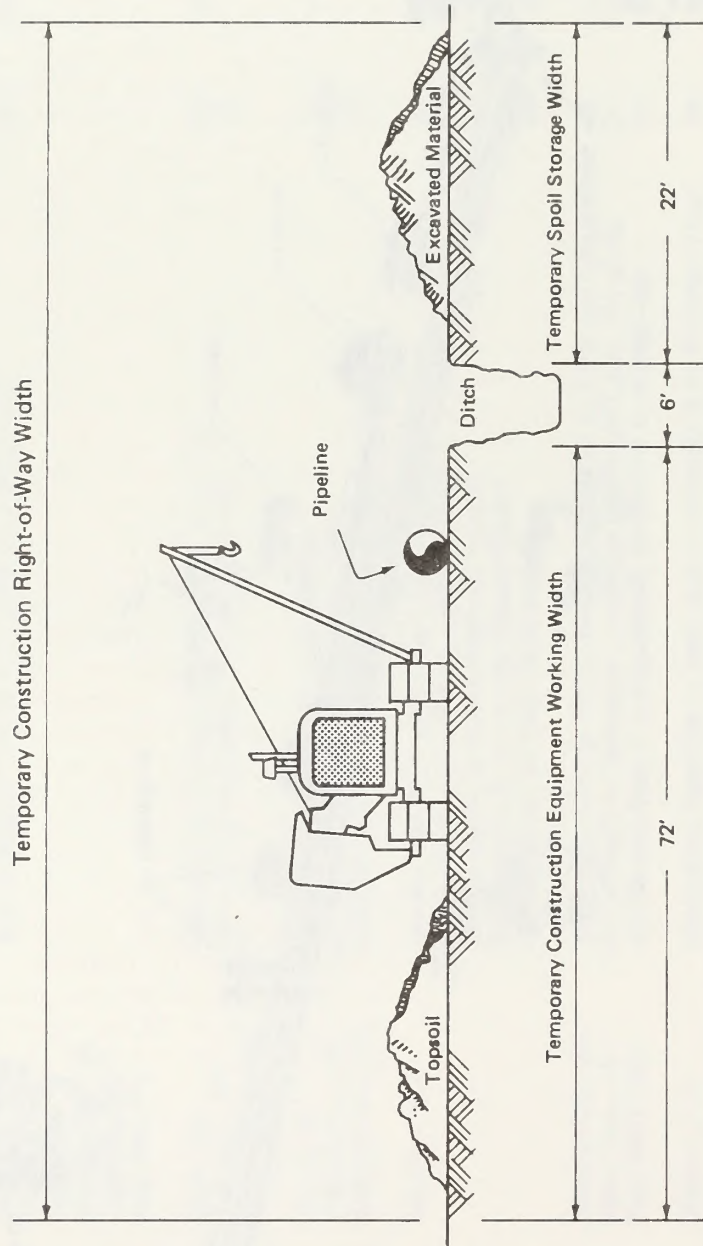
CONSTRUCTION RIGHT-OF-WAY CROSS SECTION
